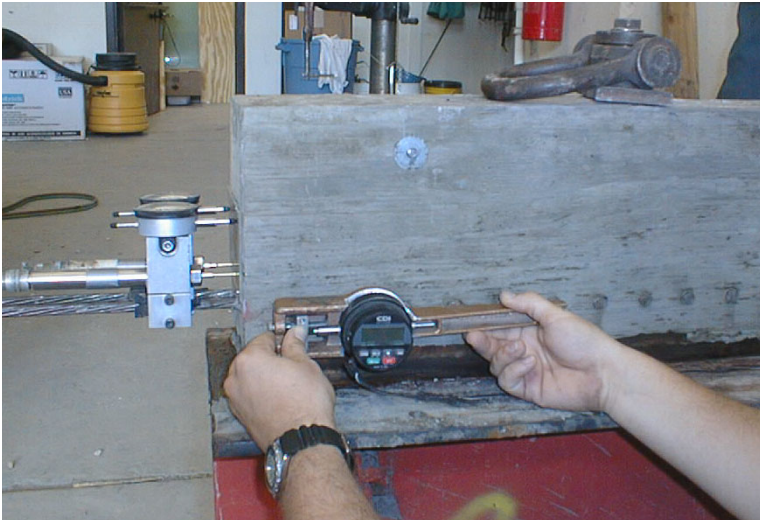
Picture of the Demountable Mechanical Strain Gauge and Target Points.
